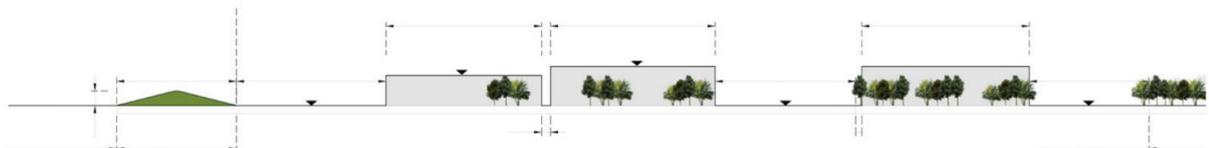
Illustrative elevation showing tree planting design to eastern facade
